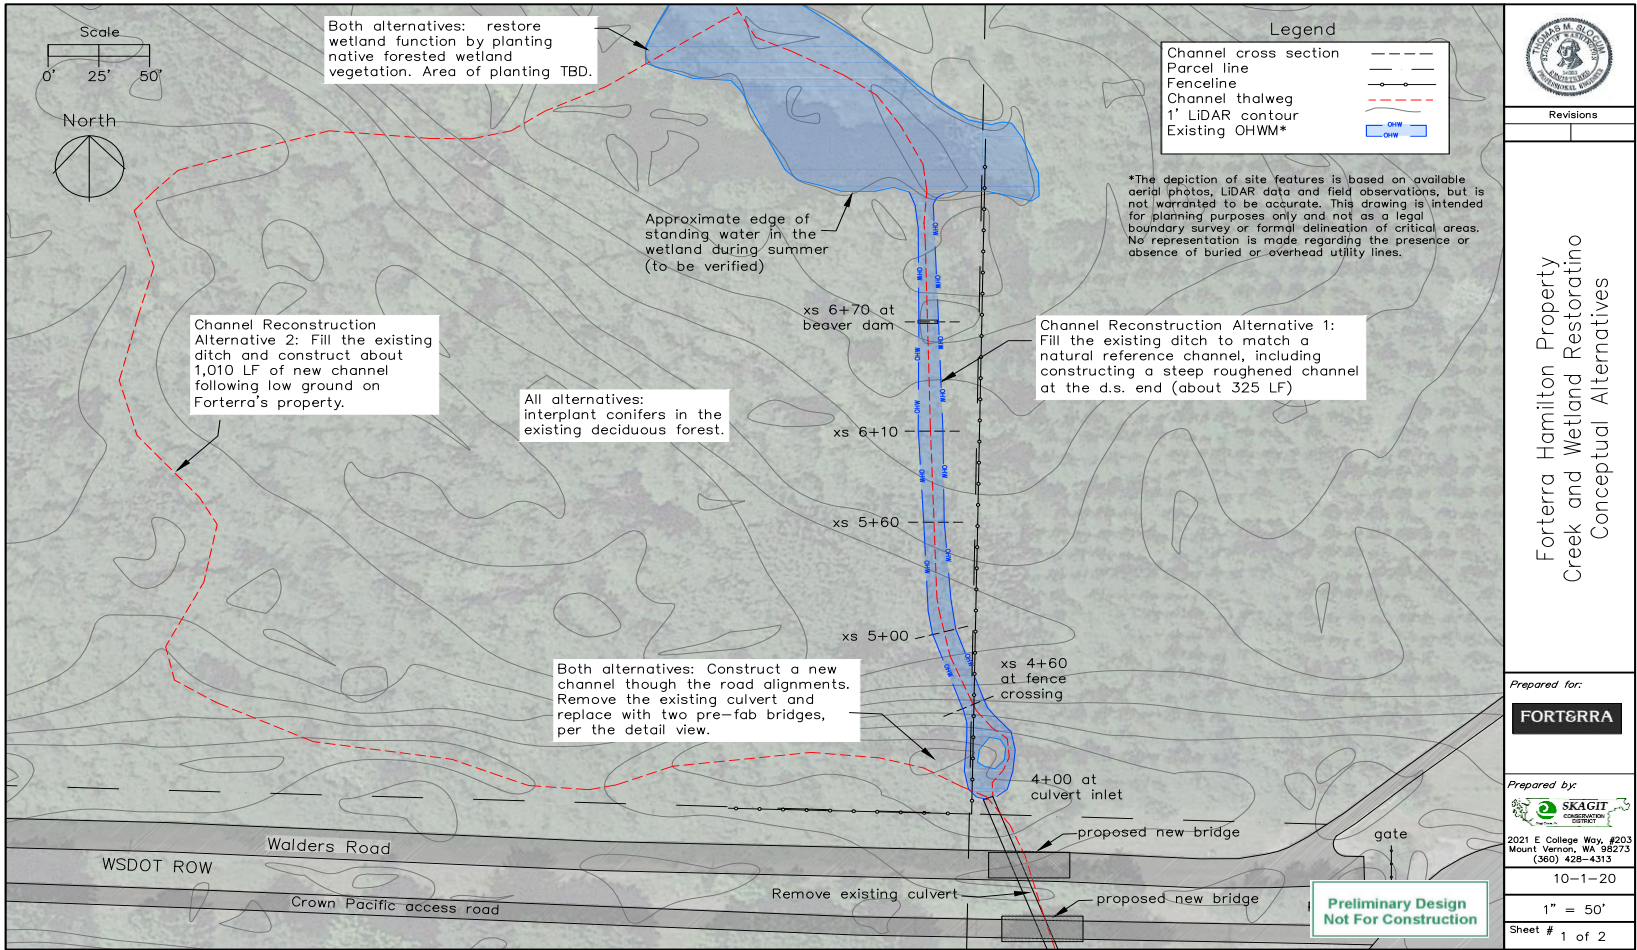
Area where new channel re-alignment is proposed, and excavation will occur.
